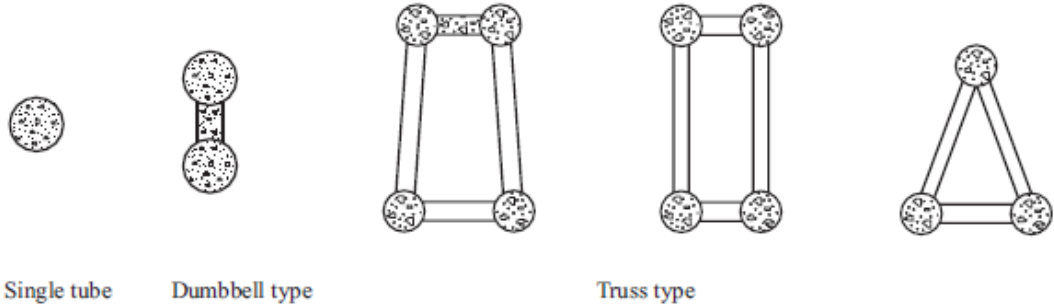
Typical ribs section in CFST arch bridges (adapted from [1])
